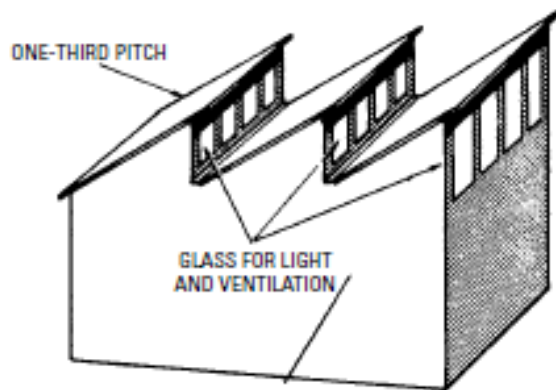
A saw-tooth roof used on factories for light and ventilation.
